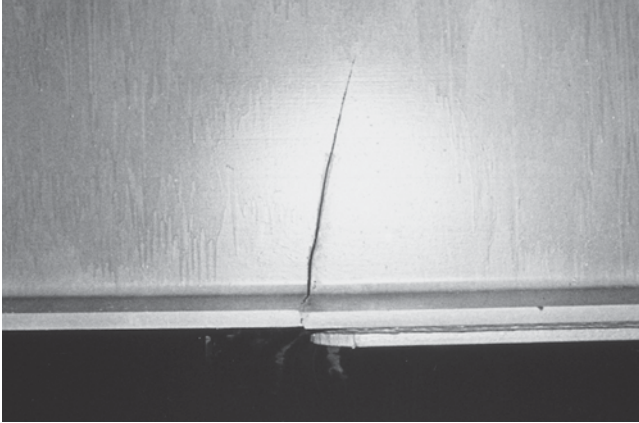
Development of fatigue crack at cover plate ends on the multibeam Yellow Mill Pond Bridge in Connecticut in 1976. (Courtesy: John W. Fisher.)
